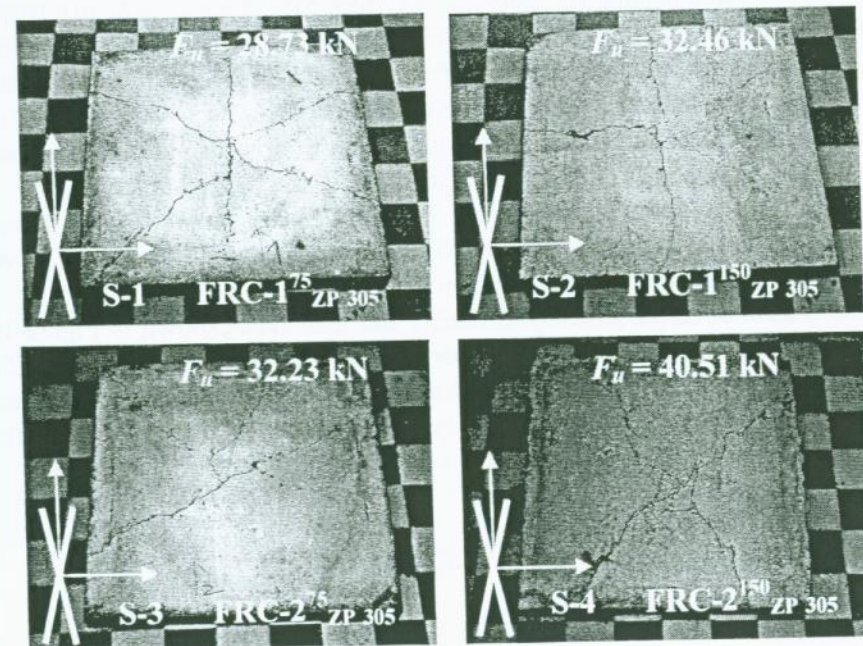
Crack pattern of steel fibre reinforced concrete slabs
